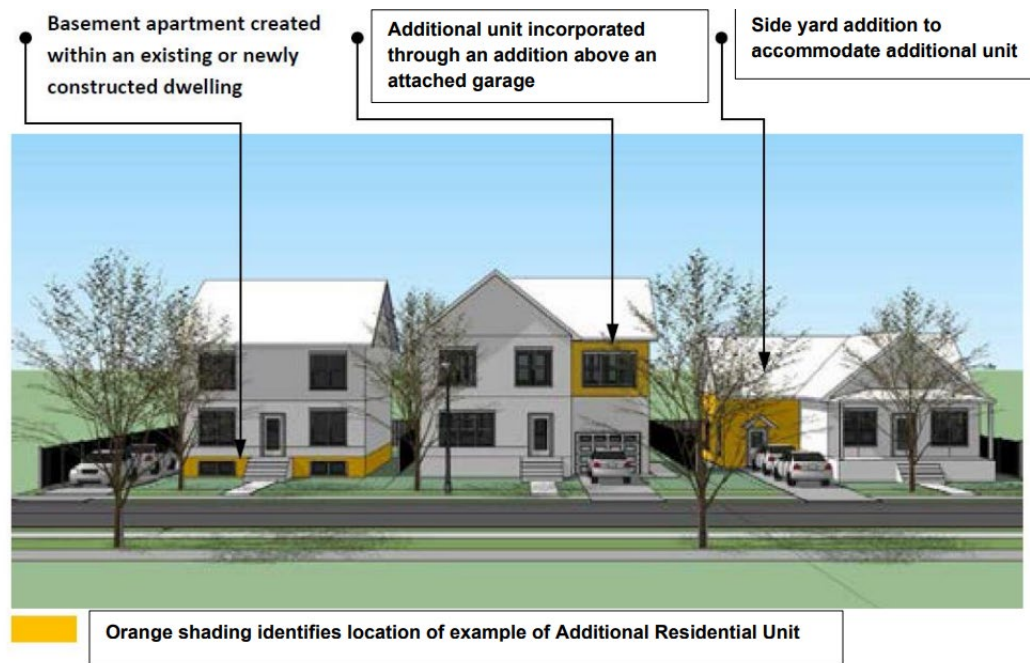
ARU locations within buildings (source: East Nipissing Official Plan)
